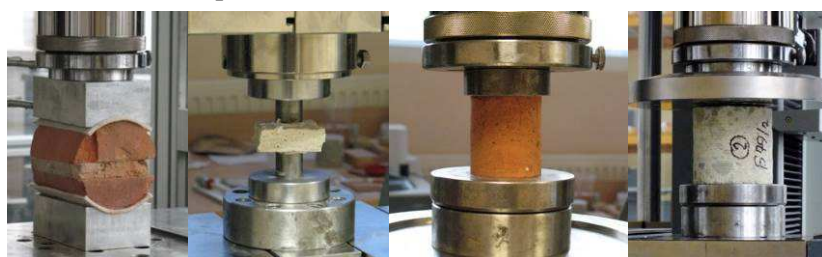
Testing the compressive strength of the masonry wall, mortar, brick and concrete (from left)
